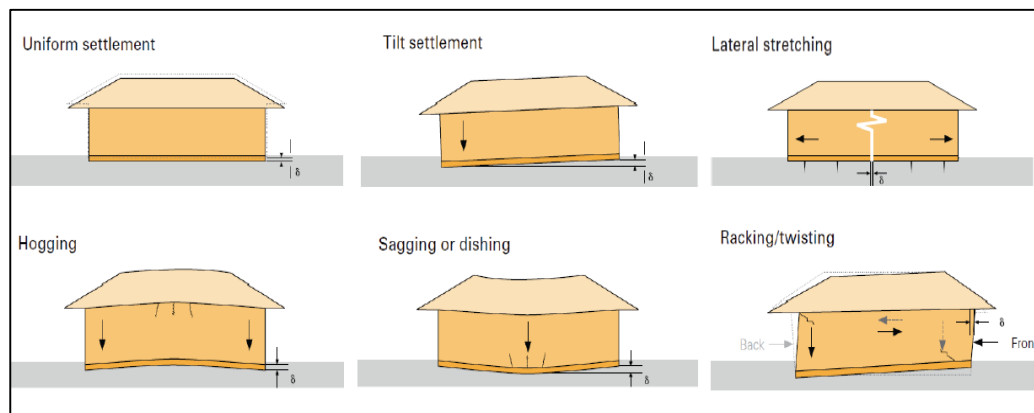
Schematic plot of typical damage patterns for house foundations (DBH 2011)
